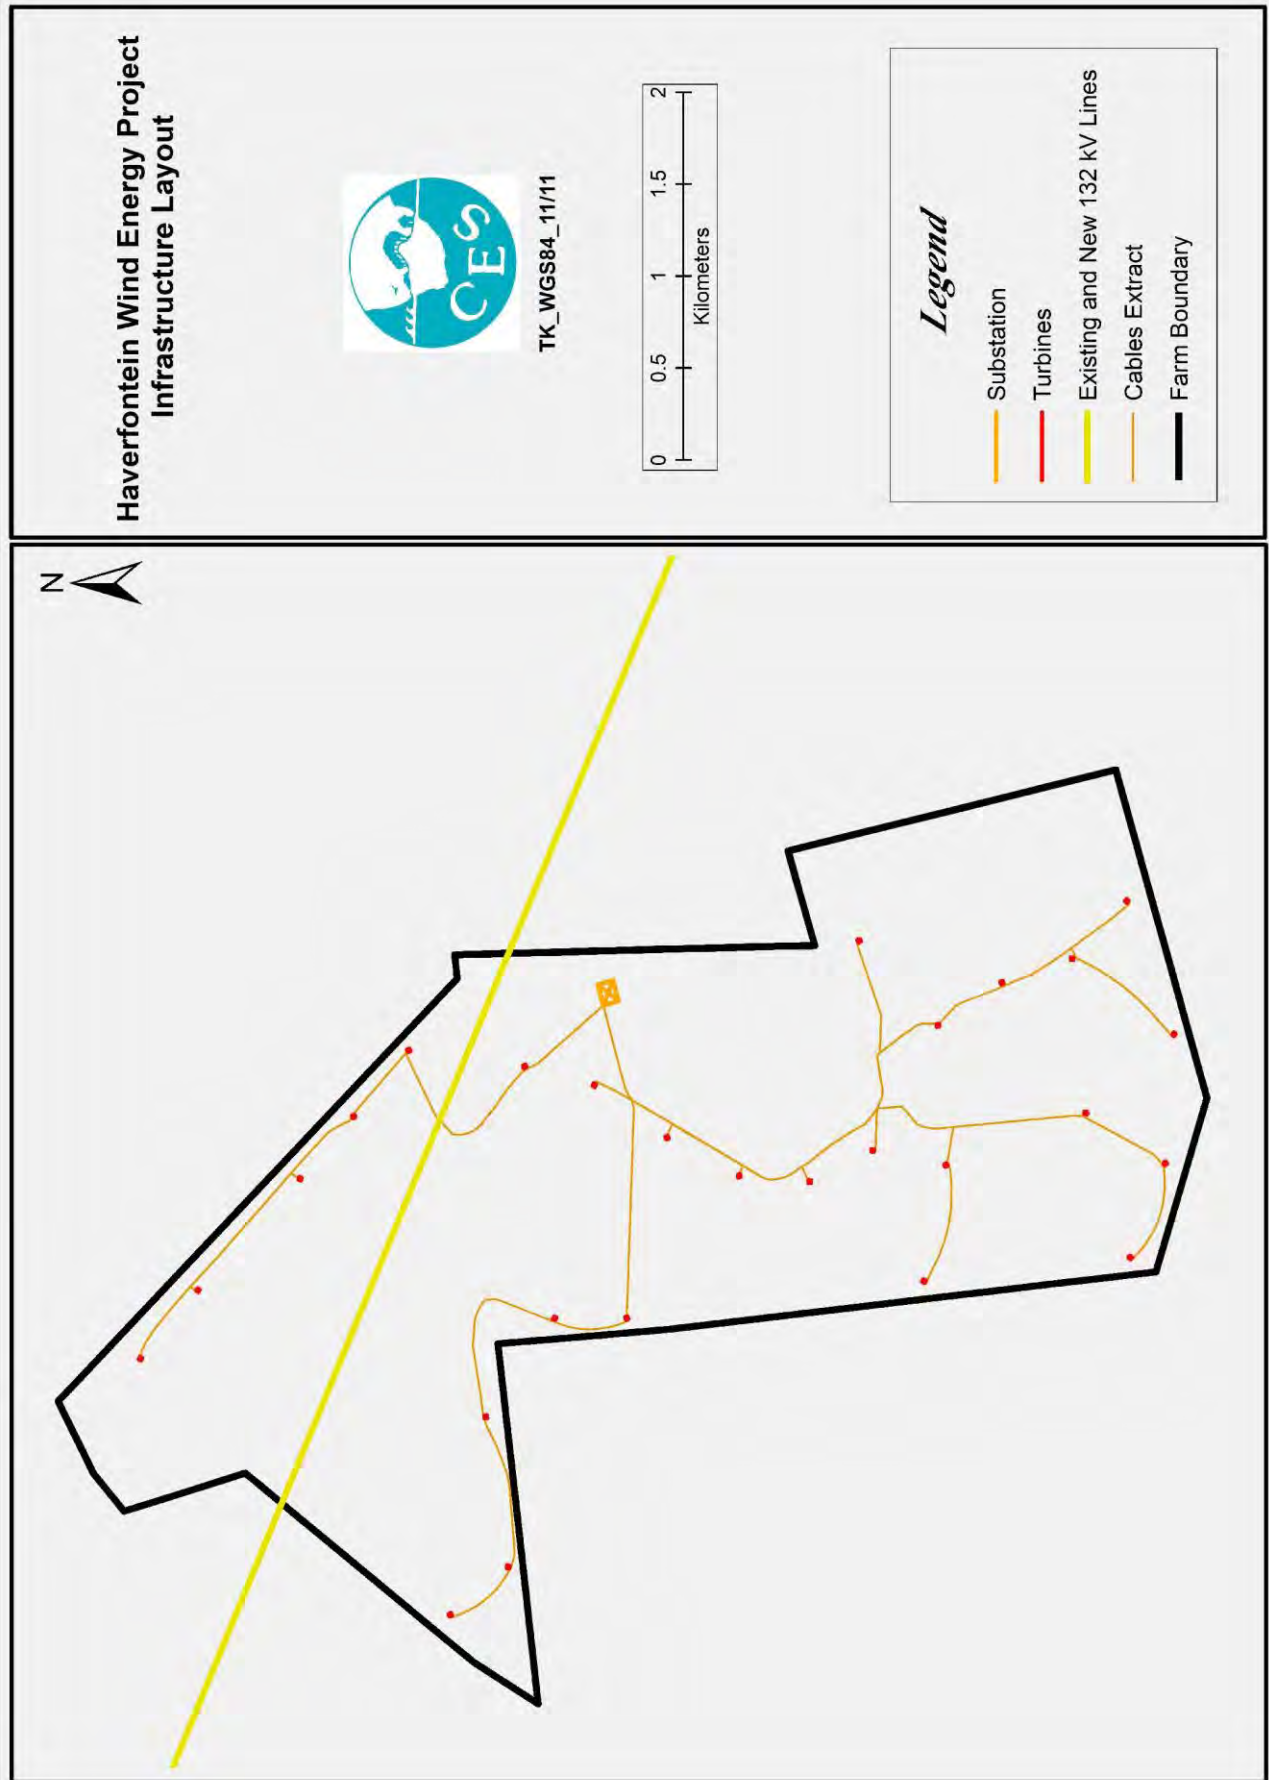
Overview of the proposed cabling layout, substation location and point of interconnection (yellow 132kV line traversing the site)
